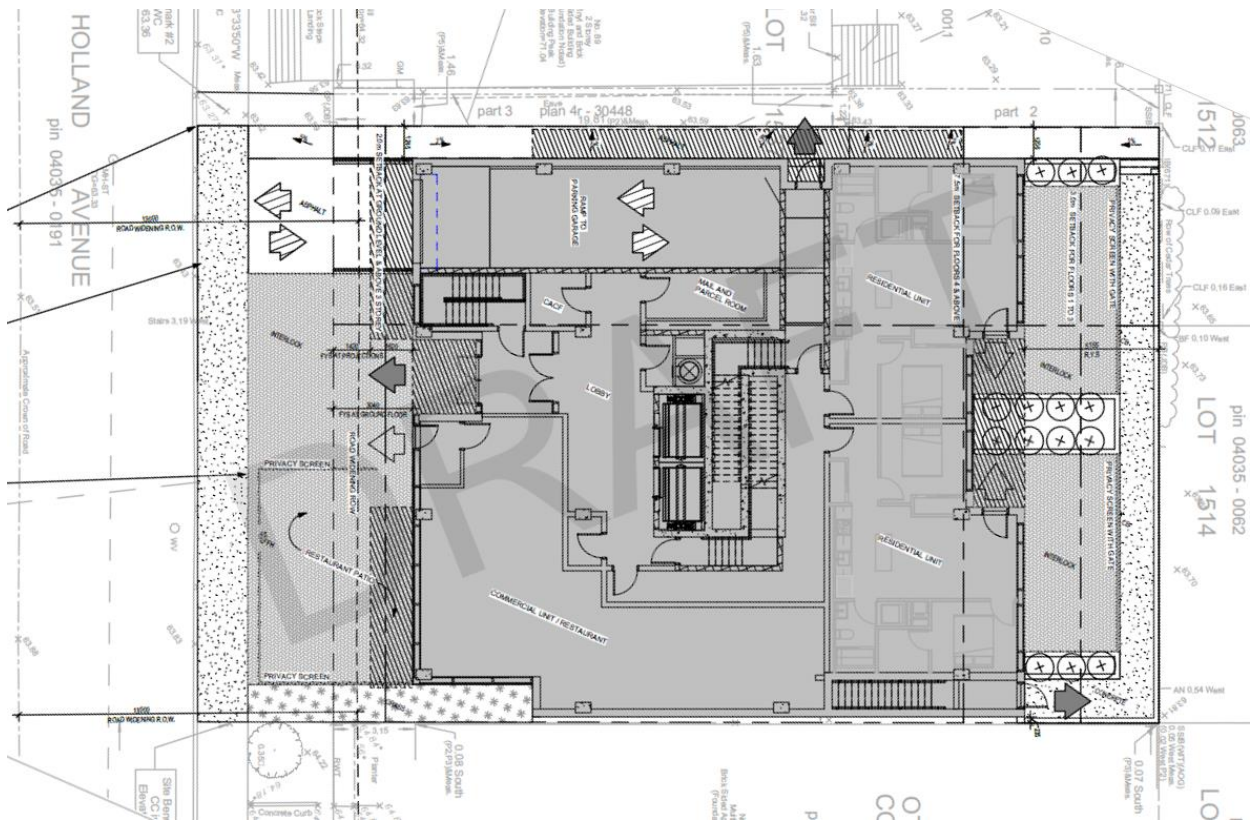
EXCERPT OF SITE PLAN (CHMIEL ARCHITECTS)
